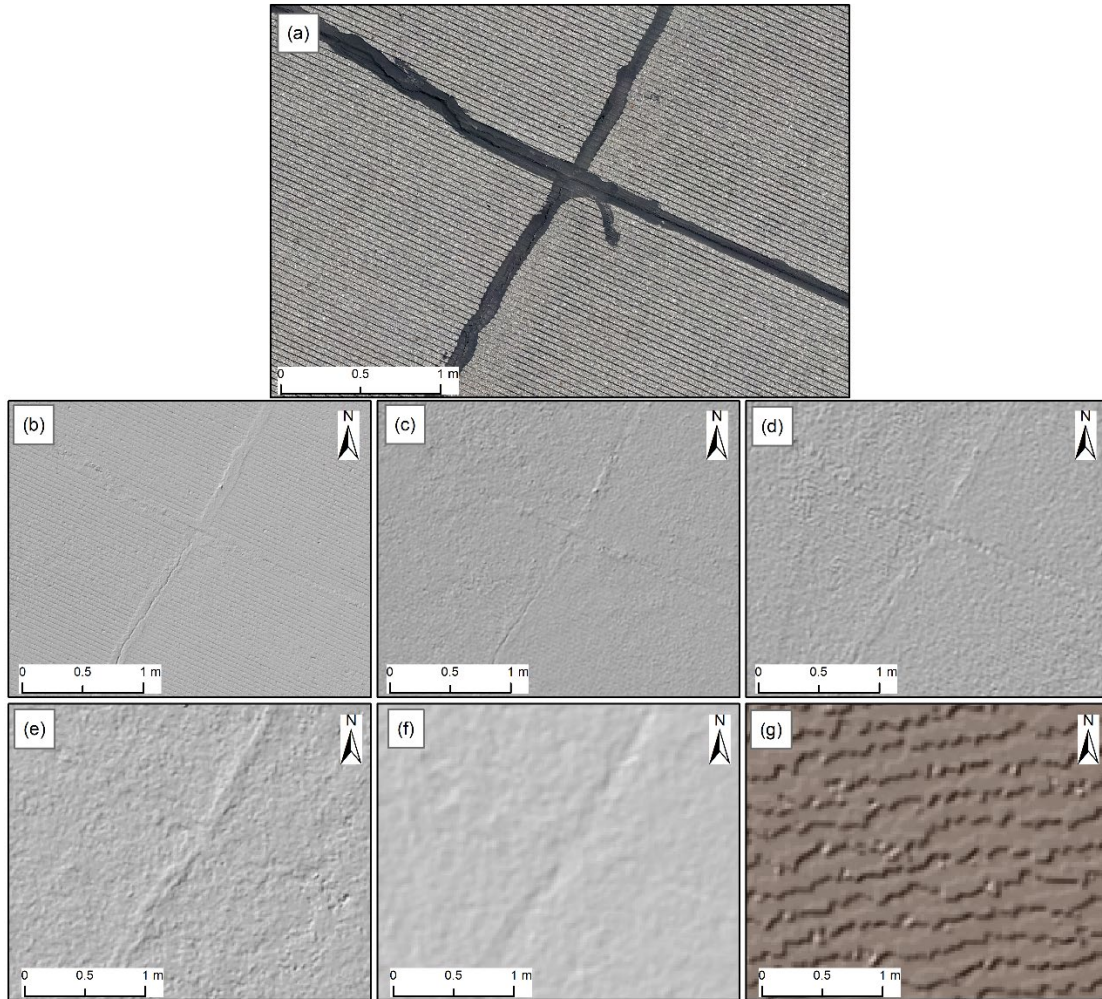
Sealed L&T Cracks and Weathering (L) on Asphalt Overlay Over Asphalt Concrete Pavement at TTF: (a) 0.8-mm/pix Orthophoto, (b) 3-mm/pix DEM, (c) 5.8-mm/pix DEM, (d) 9.2-mm/pix DEM, (e) 9.6-mm/pix DEM, (f) 19.6-mm/pix DEM, and (g) 23-mm/pix DEM
